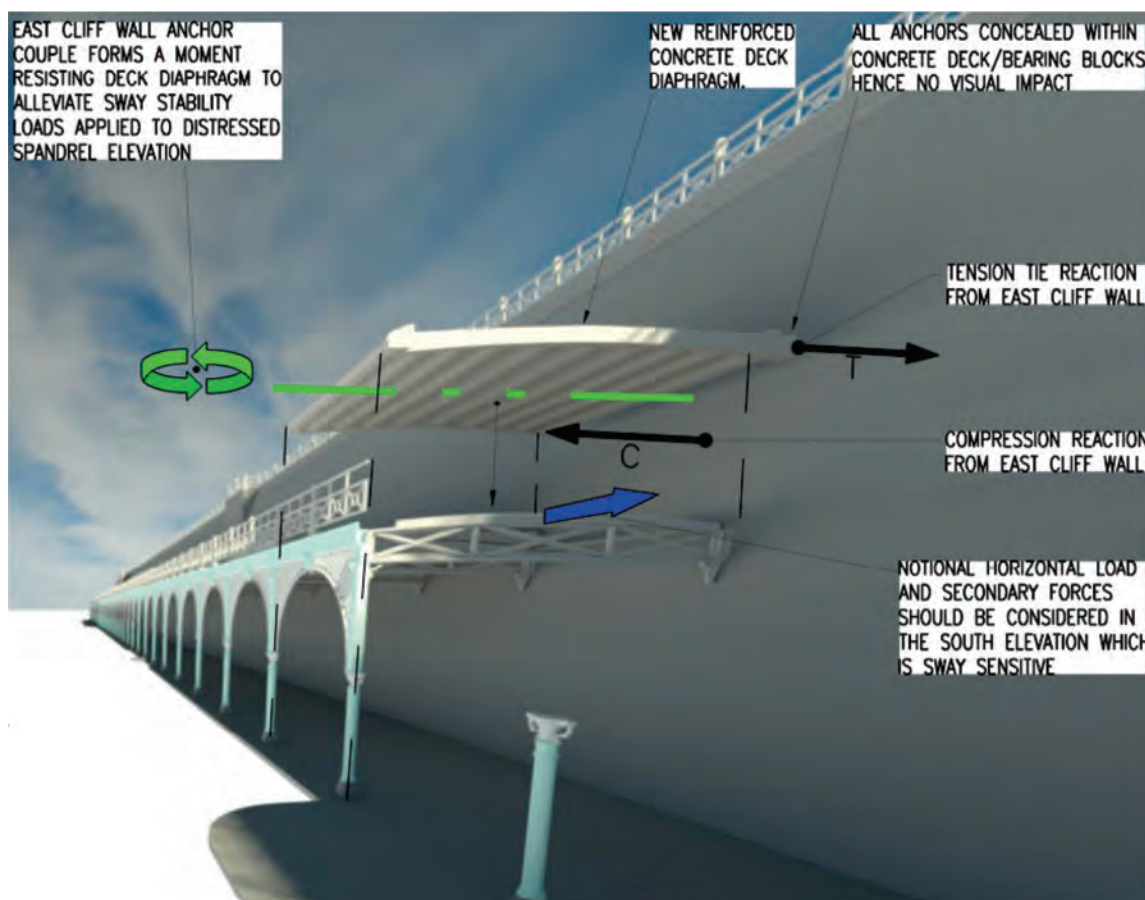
Sketch indicating structural reasoning for introduction of deck diaphragm tying action
